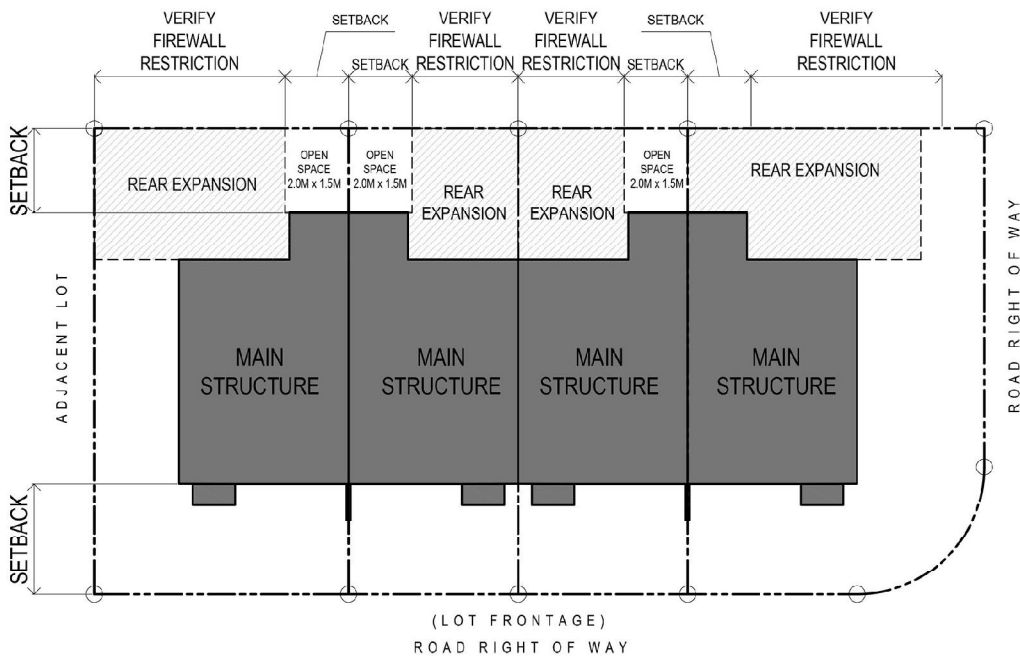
Second Floor Expansion Area for BP220 Development - Townhouses
